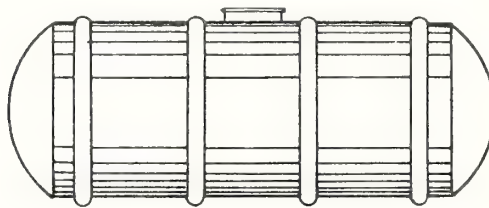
Precast Concrete Storm Drain Pipe Tank
